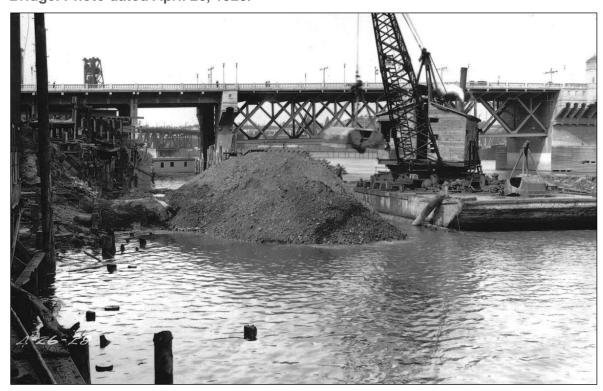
Dredging Harbor Wall fill, Burnside Bridge in the background. Photo dated April 26, 1928.
